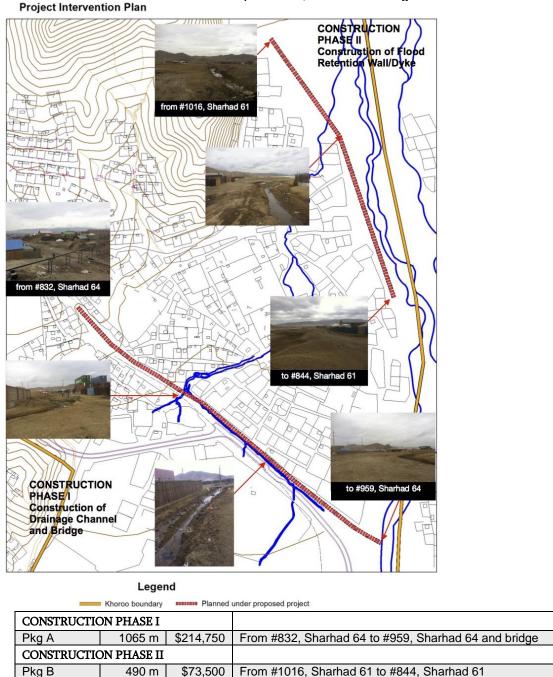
Area 3: Bayanzurkh district (north-east) Khoroo 9 proposed flood protection and drainage interventions
